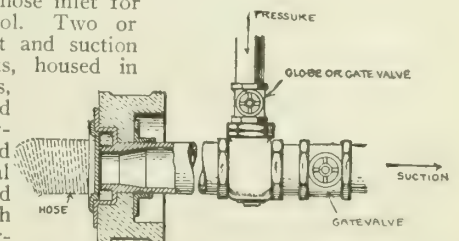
PRESSURE INLET AND SUCTION CLEANER OUTLET UNIT AND FITTINGS
